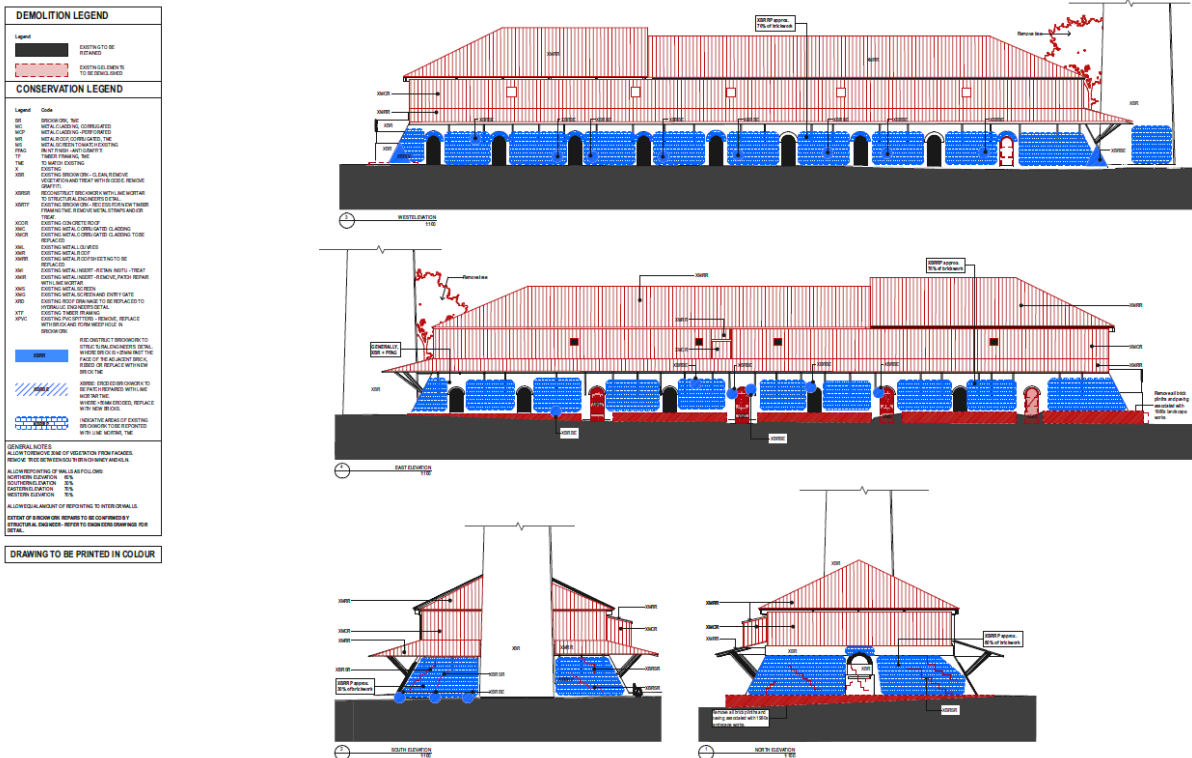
Proposed Hardy Patent Kiln Conservation Elevations
